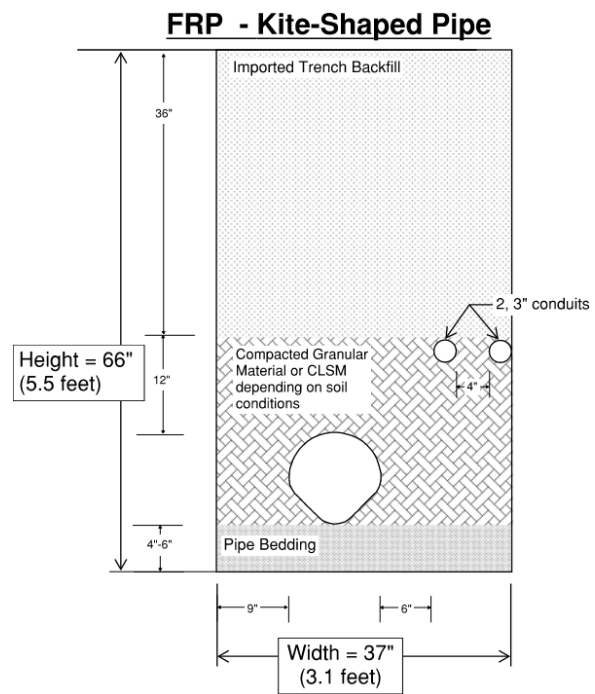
FRP Pipe - Kite-Shaped Pipe Trench Section
